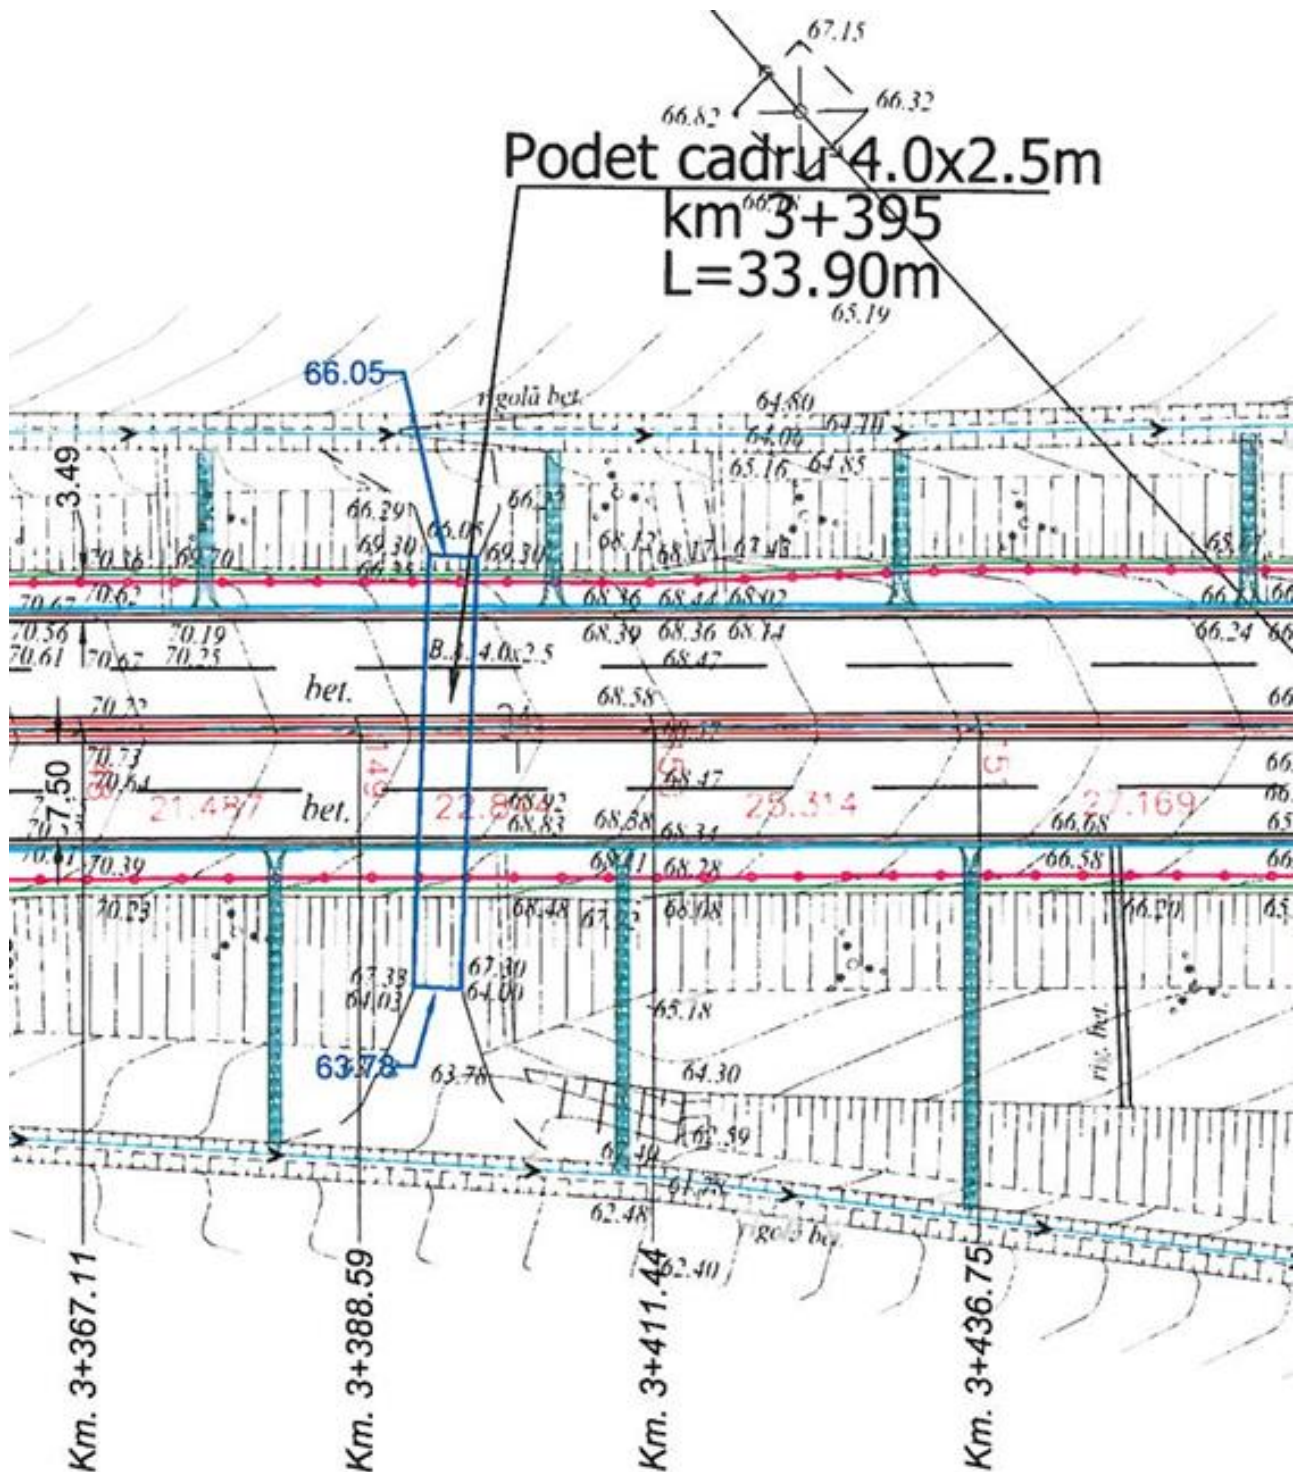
Plan of the bridge 3+395 (13+395 , which can be used by wild animals
